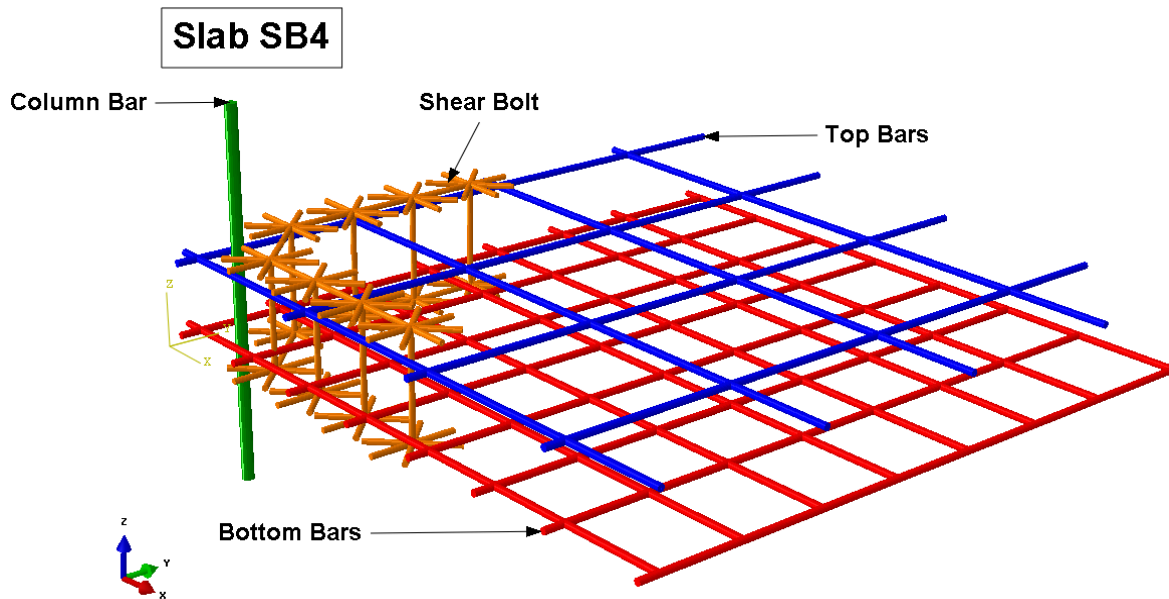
Reinforcement layout for the specimen SB4 (Note: Consider the same for the specimen SB1 except the shear bolts).
